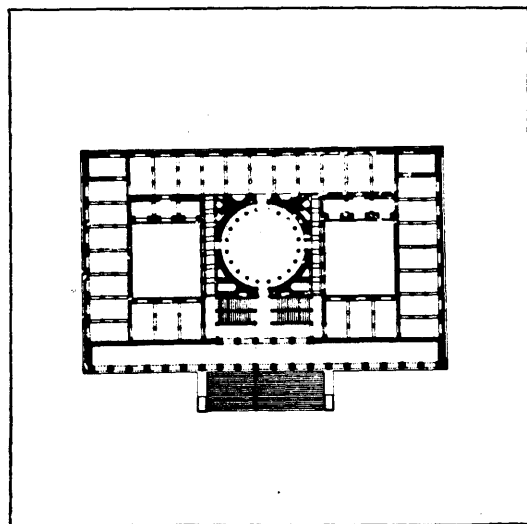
Plan of Altes Museum, Berlin. Schinkel. 1824-28
